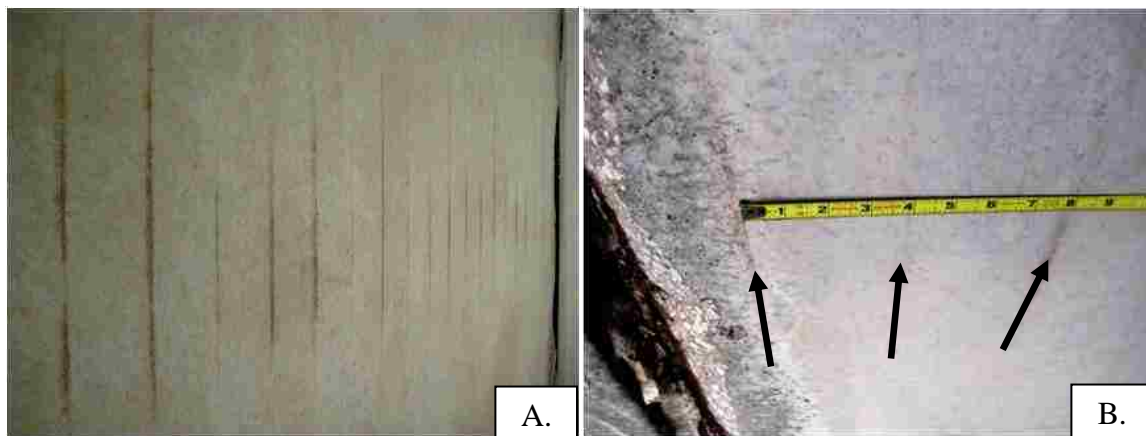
Rust stains observed on the panel surface (A. Rust stains along the entire width of the panel, B. Rust stain spacing at 4 in. on center) (Bridge A4704)
